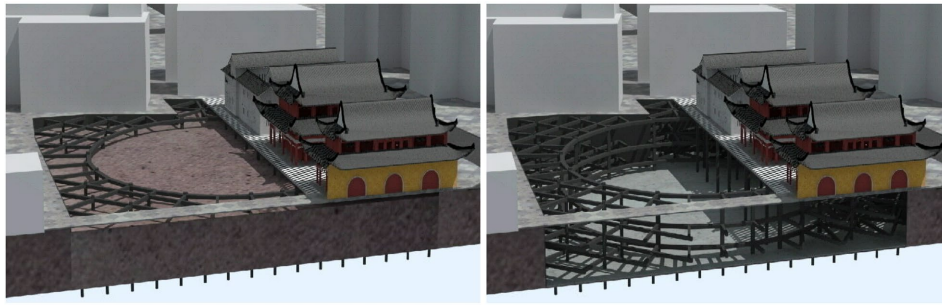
Revit modeling model of deep foundation pit under different construction stages
